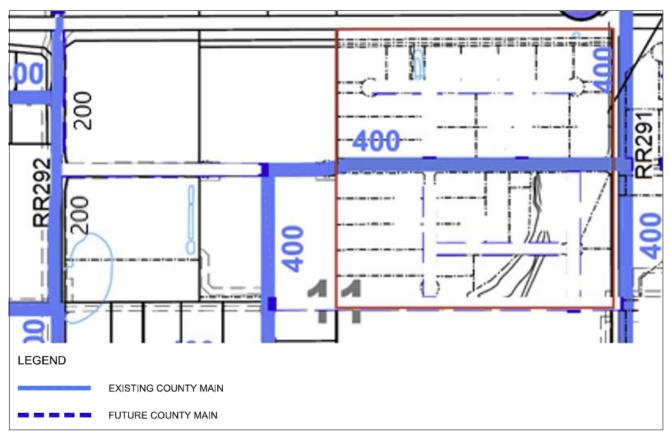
Existing Watermain Network, Balzac Master Potable Water Plan
